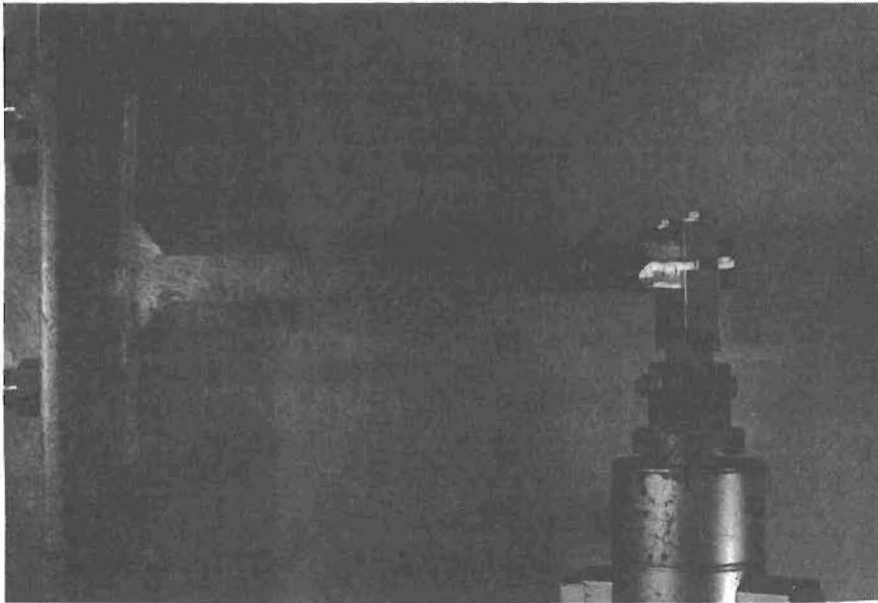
Specimen shape, support conditions, load application point, and crack location.
